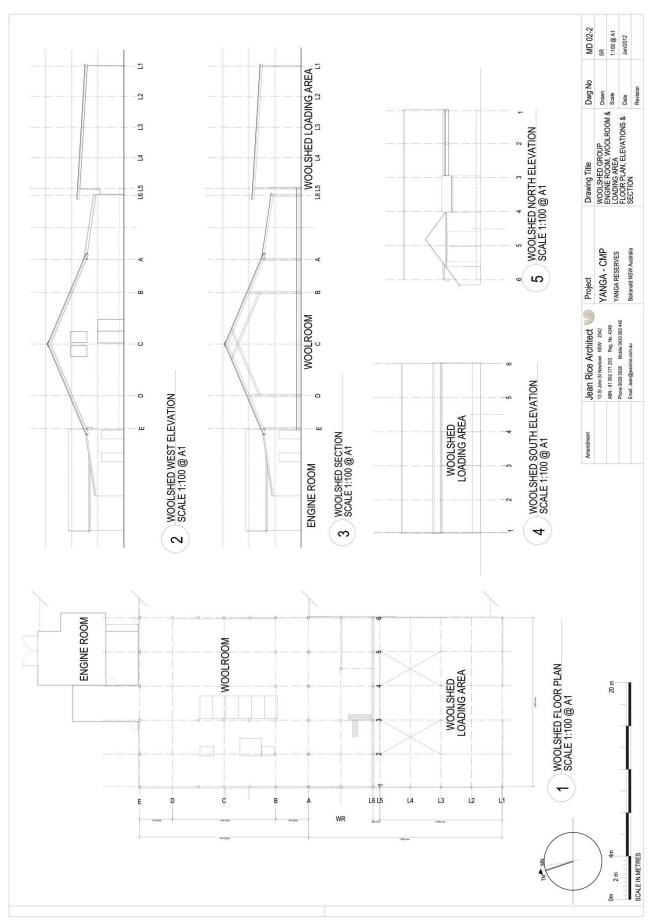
Woolshed Group. Woolshed - west-most end showing the Woolroom floor plan, elevations and a cross section. Jean Rice Architect, site assessment 2009.
